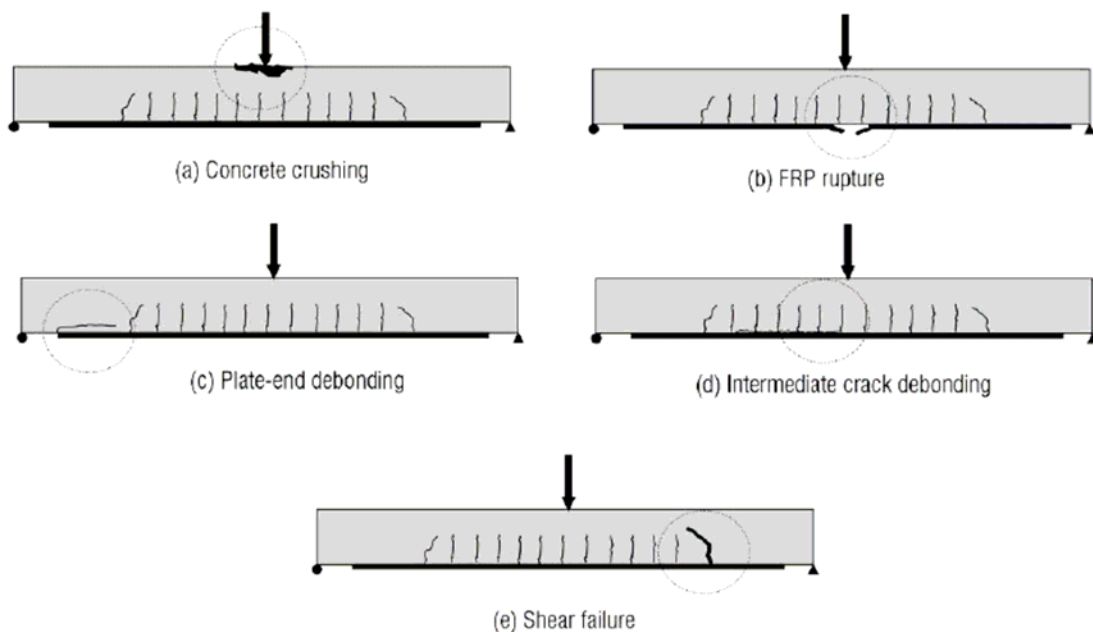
Failure modes of FRP strengthened RC structures (Own 2006)
